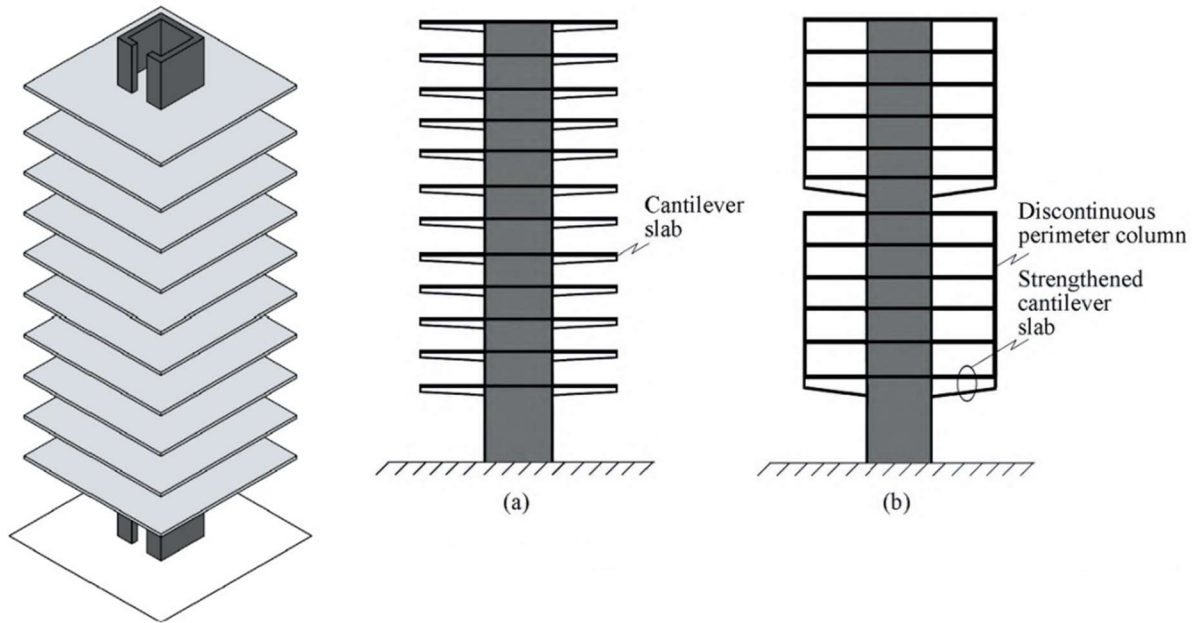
Slabs in core systems: cantilever slabs (a), strengthened cantilever slabs (b) [13]
